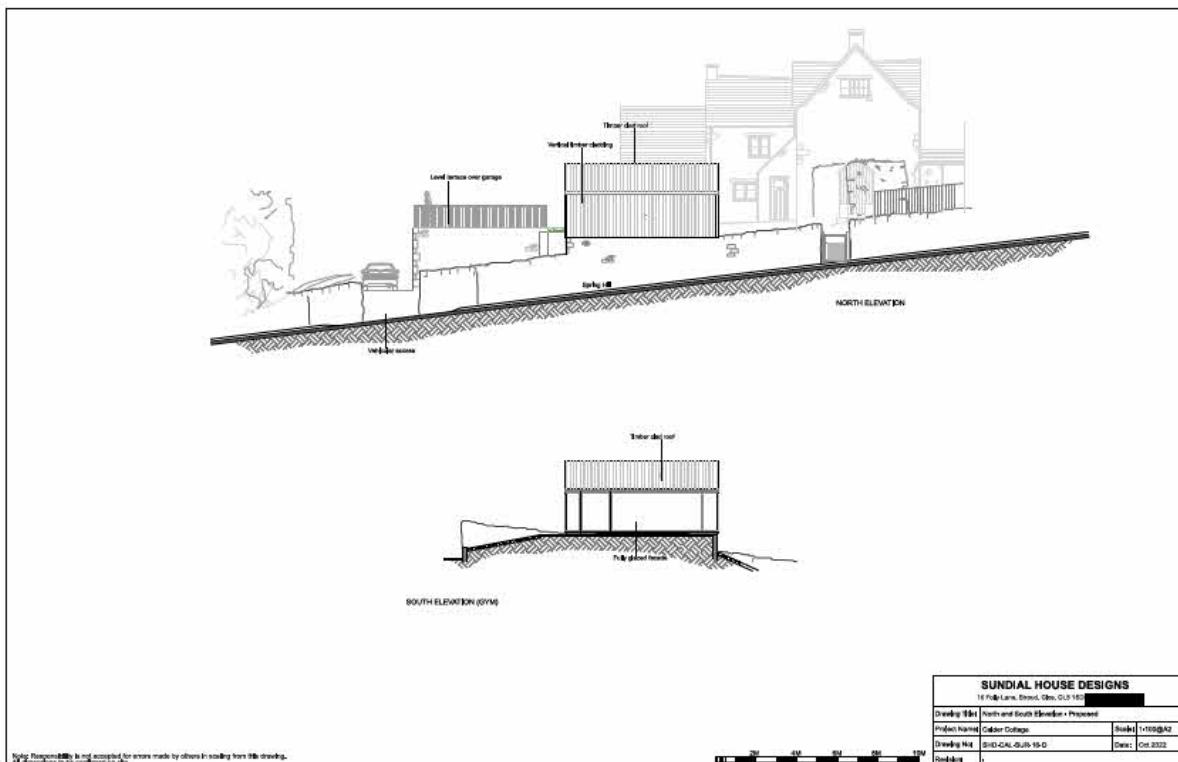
Proposed elevation – north showing new timber outbuilding © Sundial House Designs
